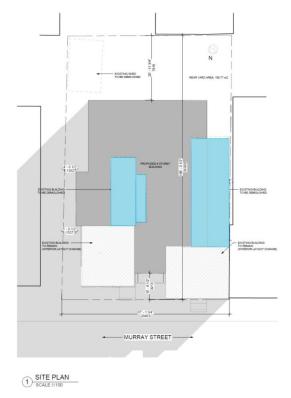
Preliminary site plan of the proposed development. The footprints of the existing buildings have a floor plate of approximately 500sq.ft. (48msq.). Note the relationship of the building at 168 Murray with the adjacent two-storey row house, illustrating the development footprint. The two existing buildings are rendered in light grey, and the rear sections that will be
